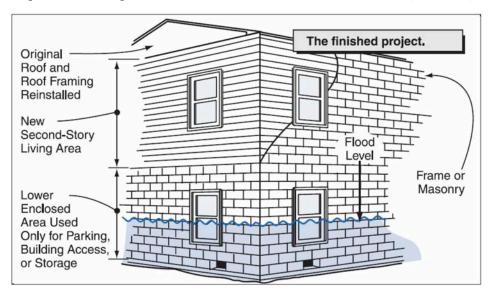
Home elevated by adding a new second story over an abandoned lower floor (FEMA, 2009)
